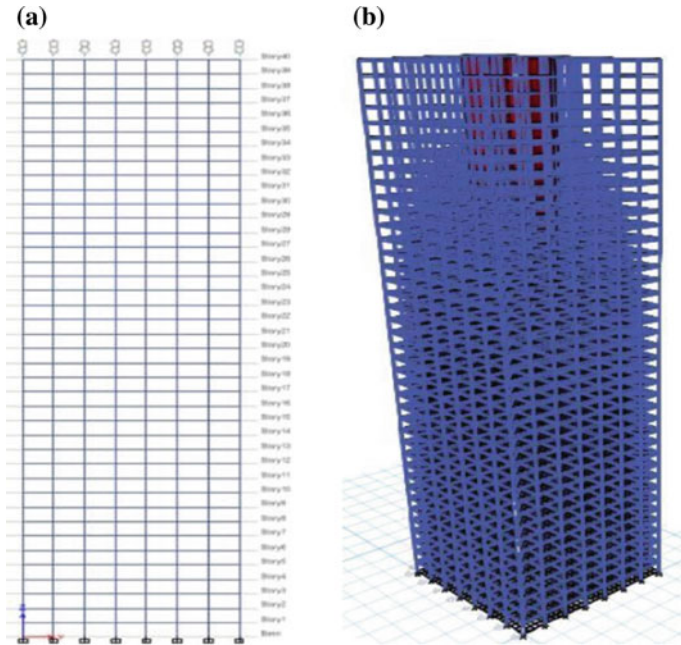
a 2D elevation view b 3D elevation view of conventional structure of conventional structure
